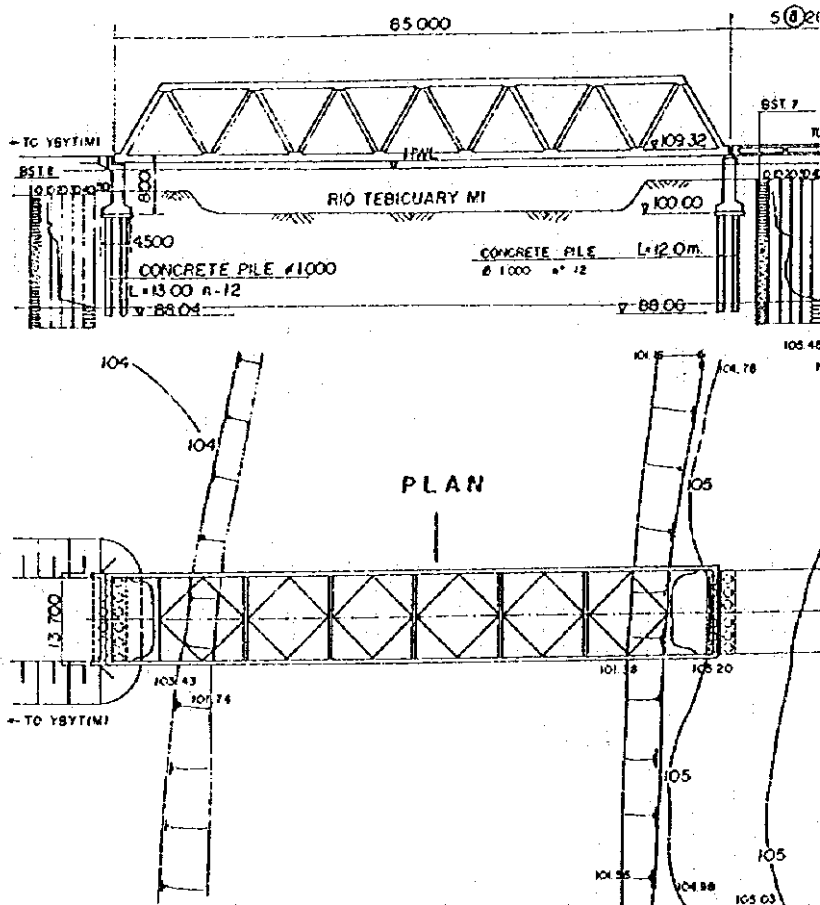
General Design of Tebicuary Mi Bridge
